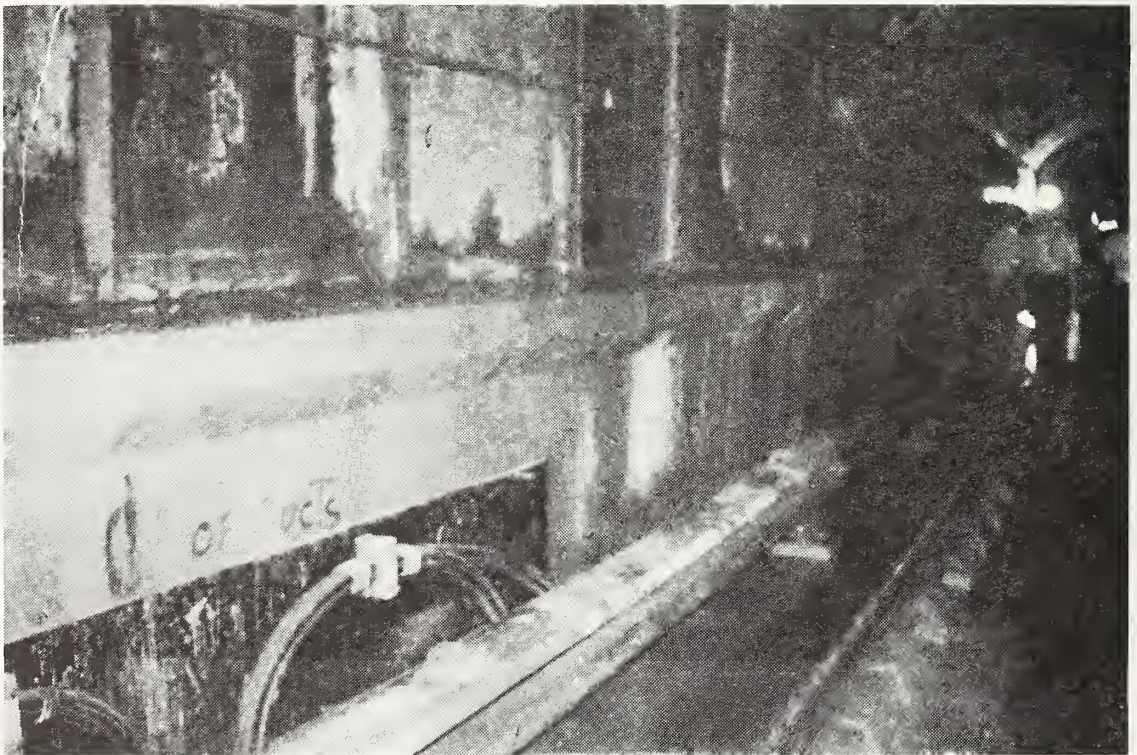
THE PPA SITE-VISIT TEAM AT THE 63RD STREET STATION
